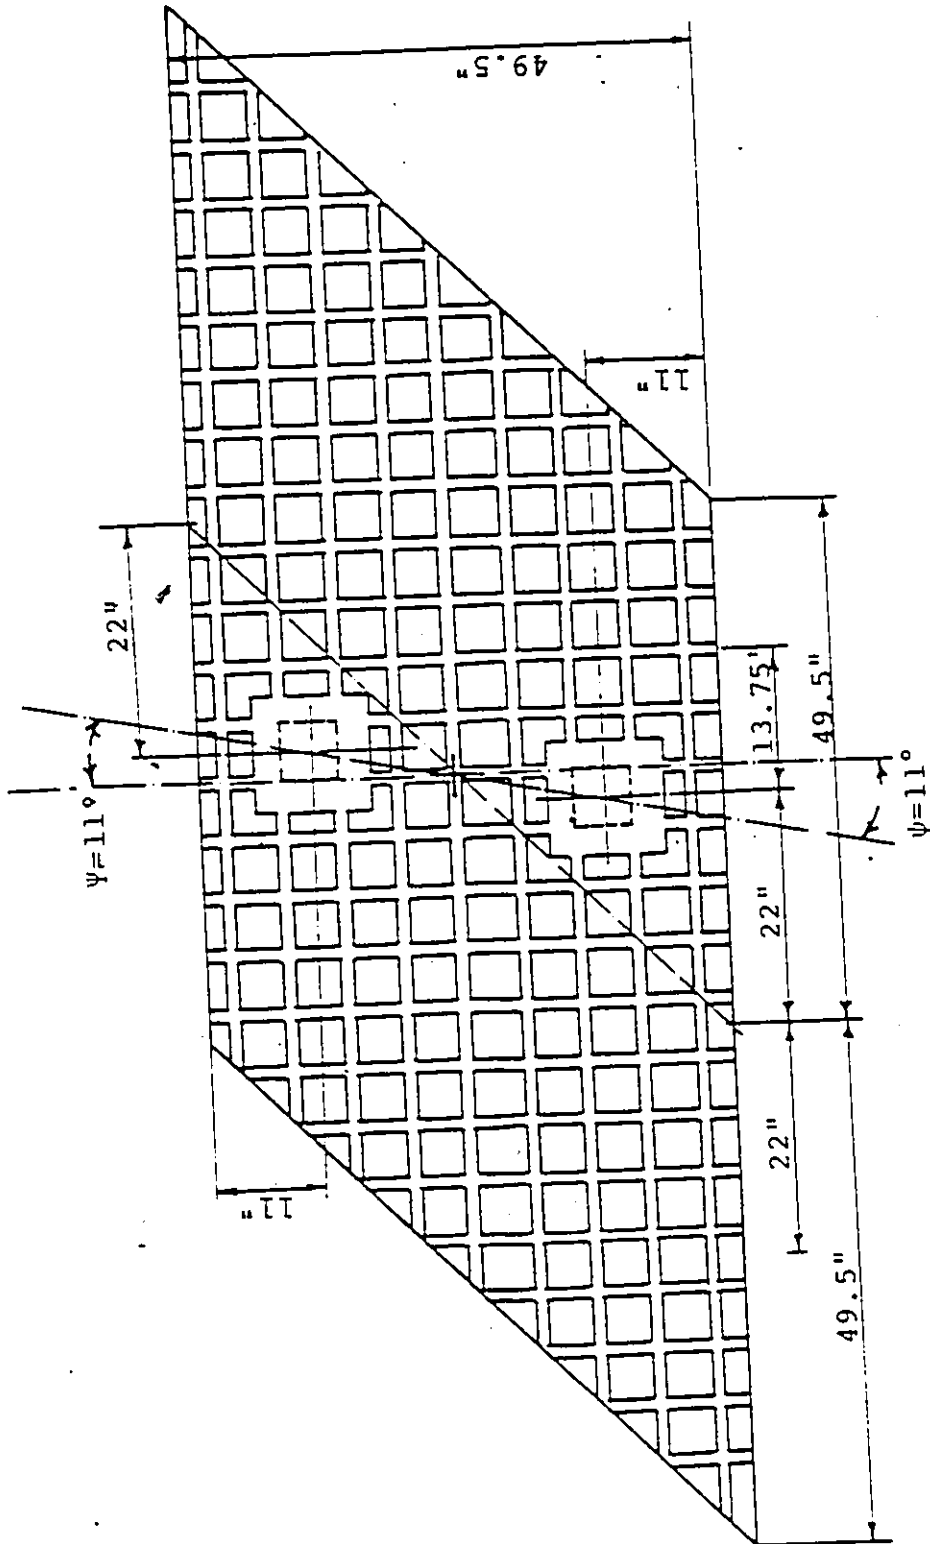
BOTTOM PLAN LAYOUT (SKEW, PC4).
